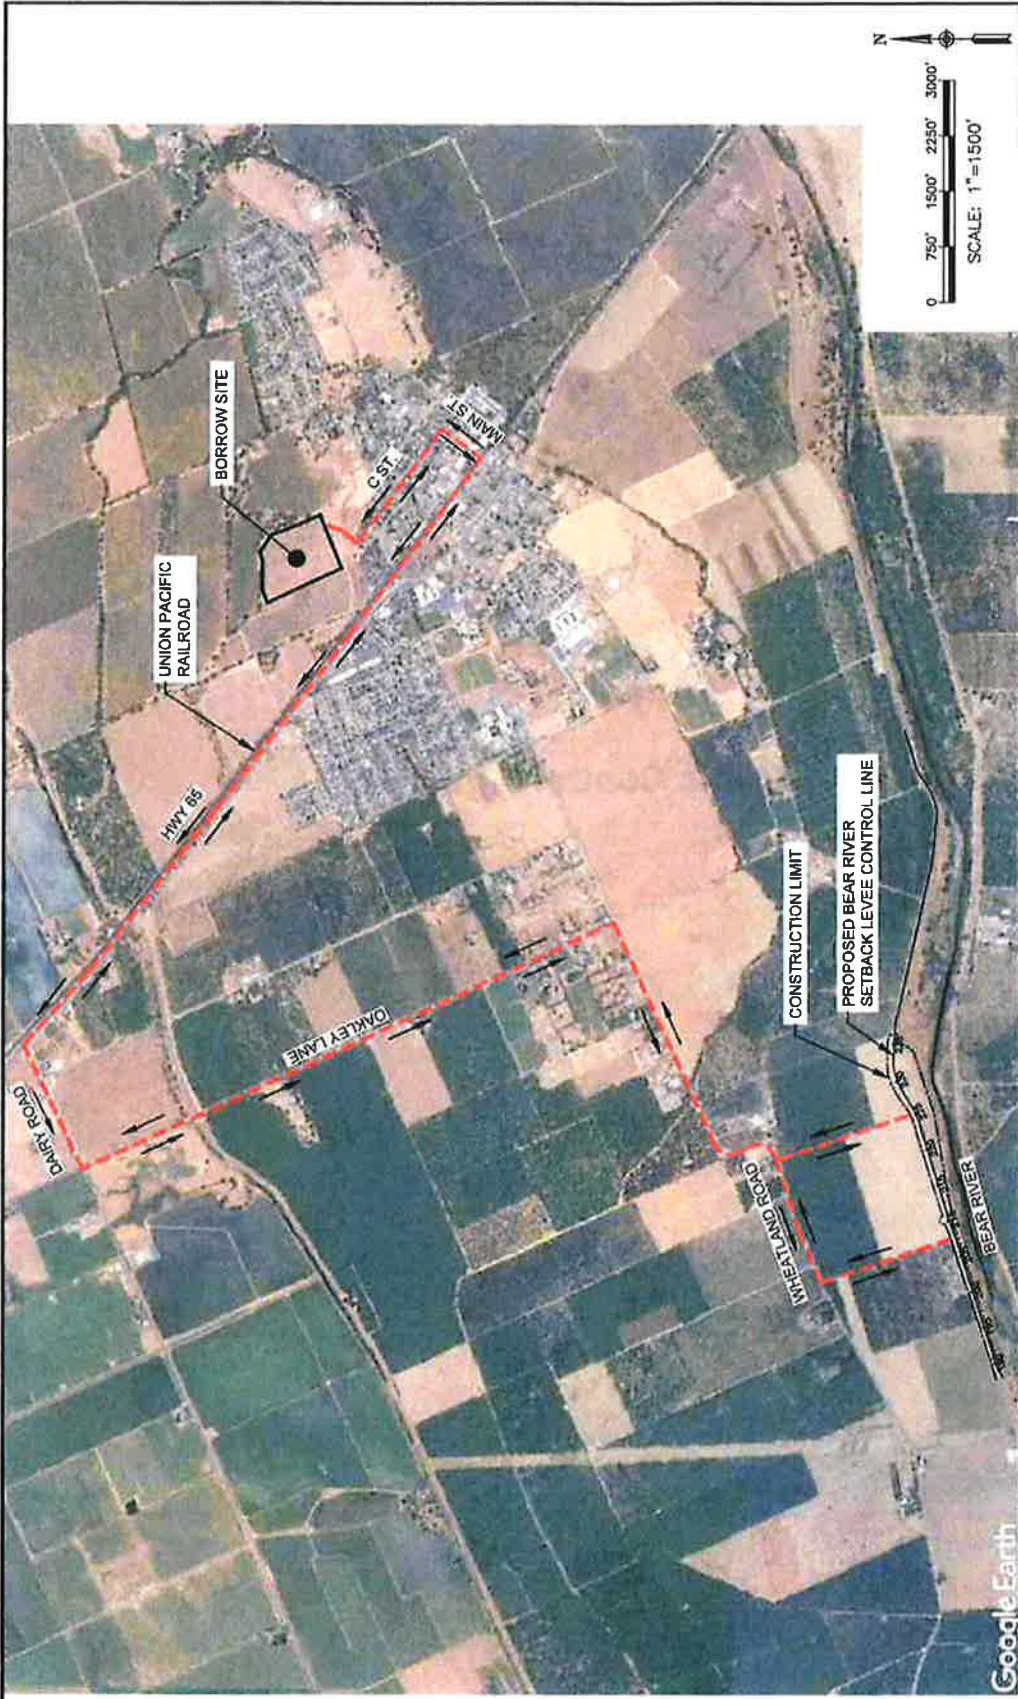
HWY 65 to Dairy and Oakley Road traffic control signage details.
